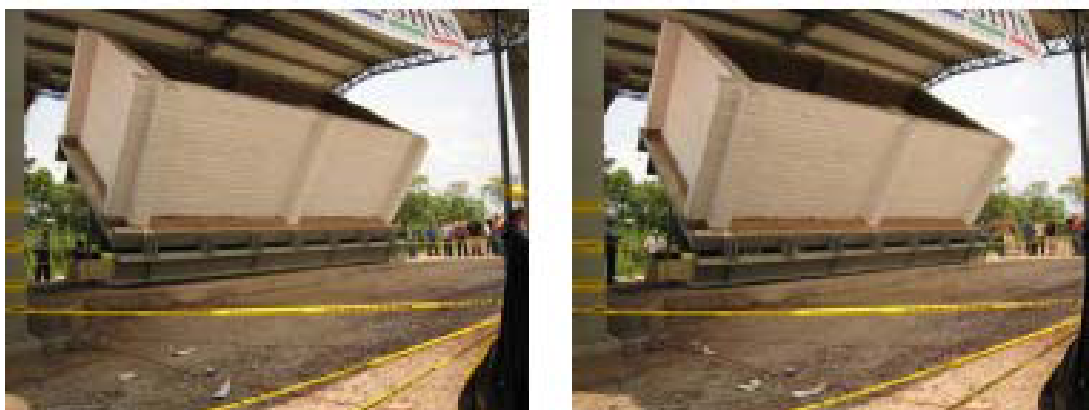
Commencement of cracking of reinforced house in the side wall at 30 degrees and cracking in the front and rear walls at 34 degrees (Pena & Lopez 2007).
